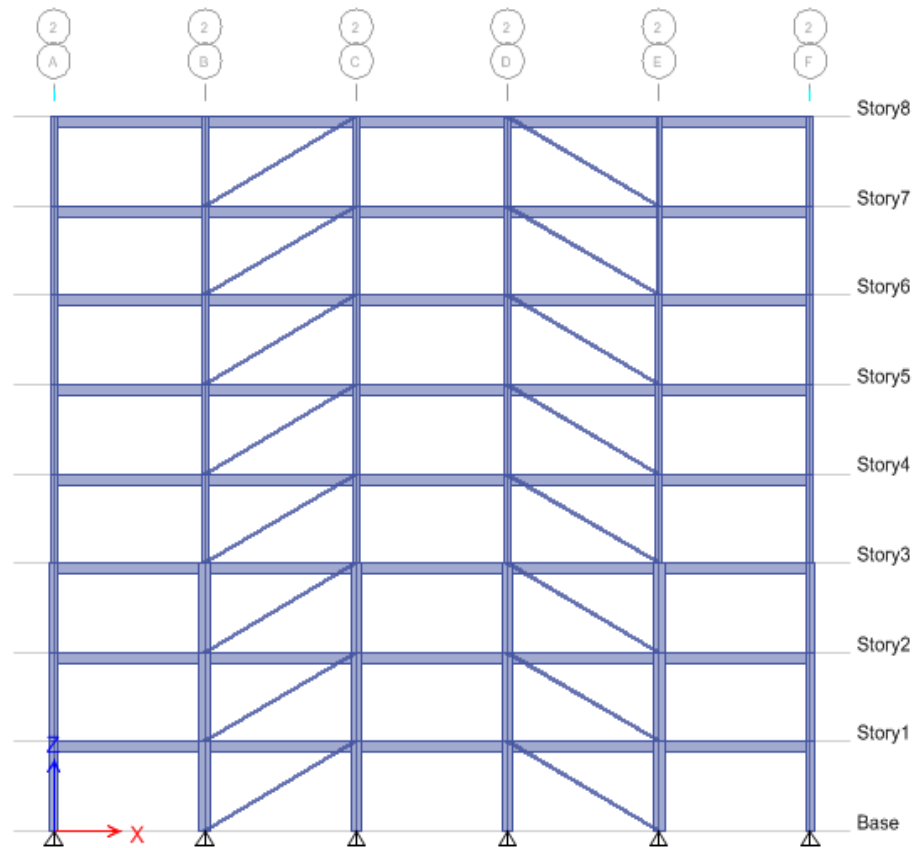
Typical I-beam and bracing elevation of the dormitory building (RB-I) in x-direction.
